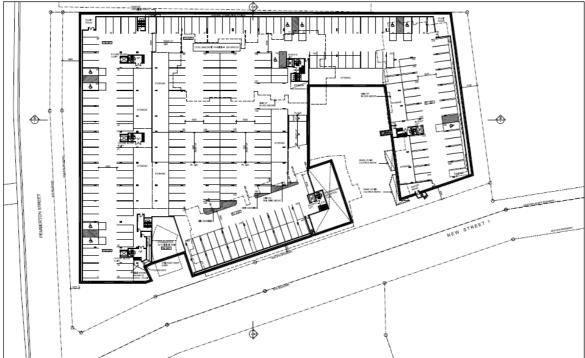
Approved Basement Plan of 42-44 Pemberton St – source Krikis, Tayler Architects.
